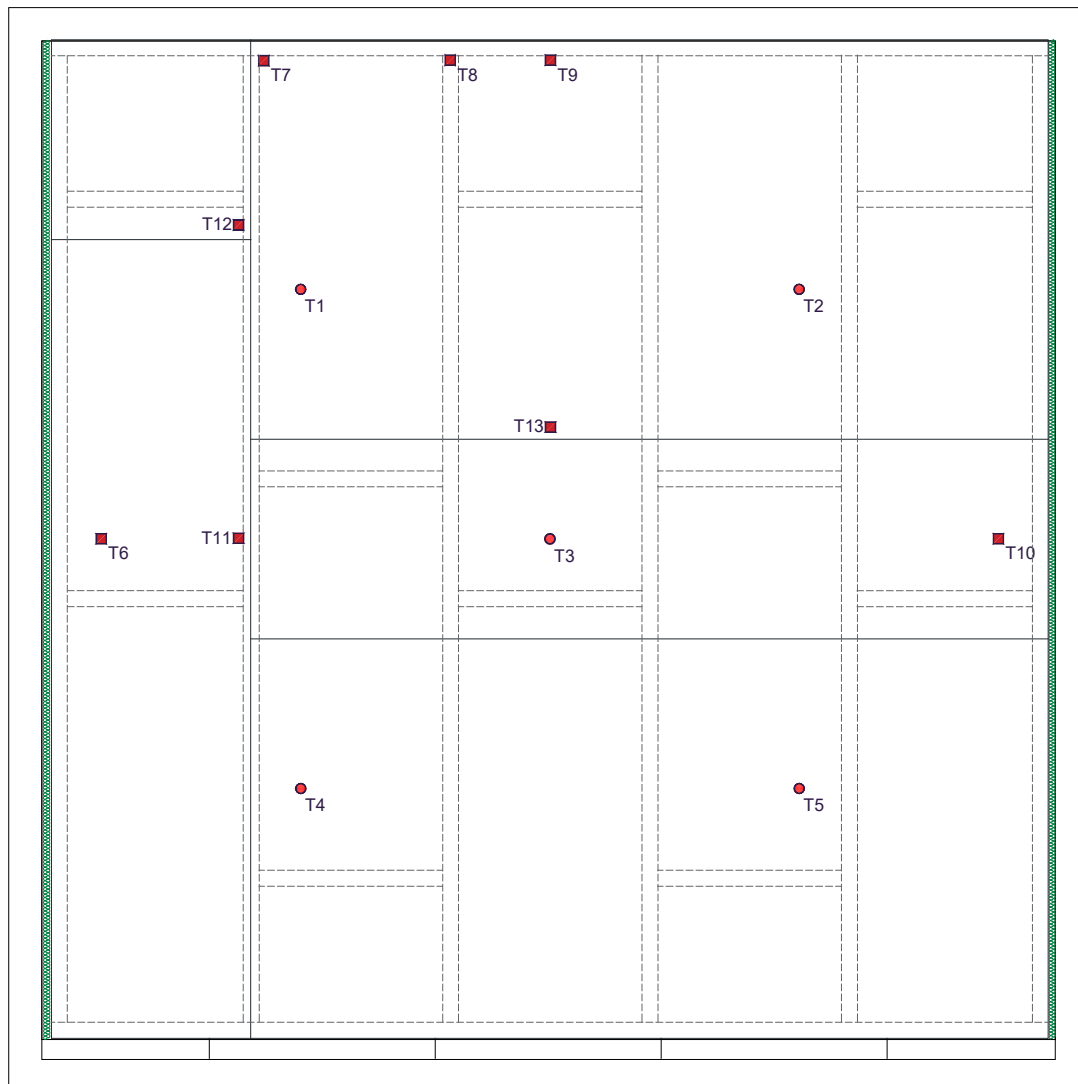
Layout of instrumentation viewed from the unexposed surface of the test construction
